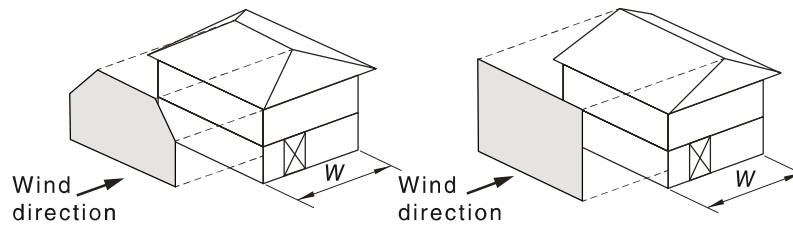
SIDE ELEVATION—LOWER STOREY OF TWO STOREYS OR SUBFLOOR—GABLE OR HIP-ENDED ROOF
